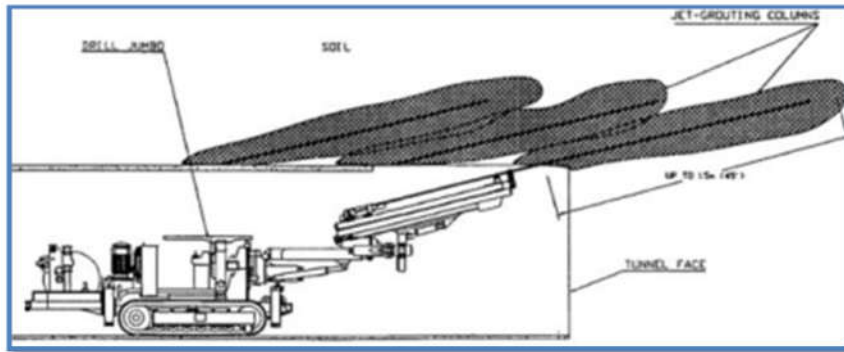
Jet grouting within a soft ground tunnel. (From Henn 1996)
